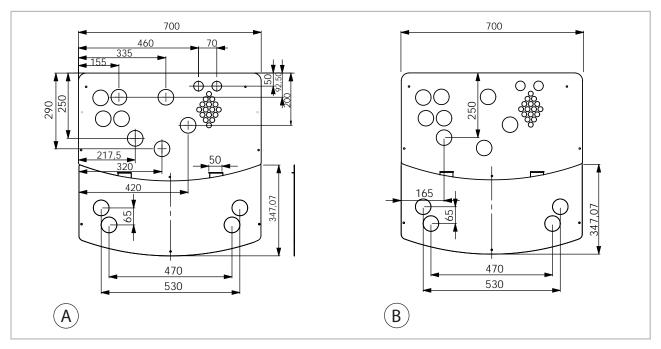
Pipe connection arrangement WKF-compact 80-170 (All dimensions in mm)
